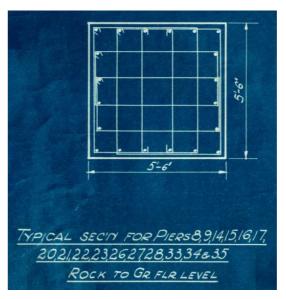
Original Structural drawing for Pier under a Typical column, founded down to rock.
